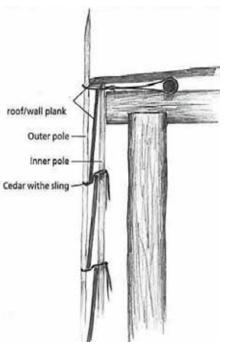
SKETCH OF CONSTRUCTION DETAIL OF A LONGHOUSE FRAME SOURCE: ARCHITECTURE OF THE SALISH SEA TRIBES OF THE PACIFIC NORTHWEST BY CHRISTINA WALLACE
